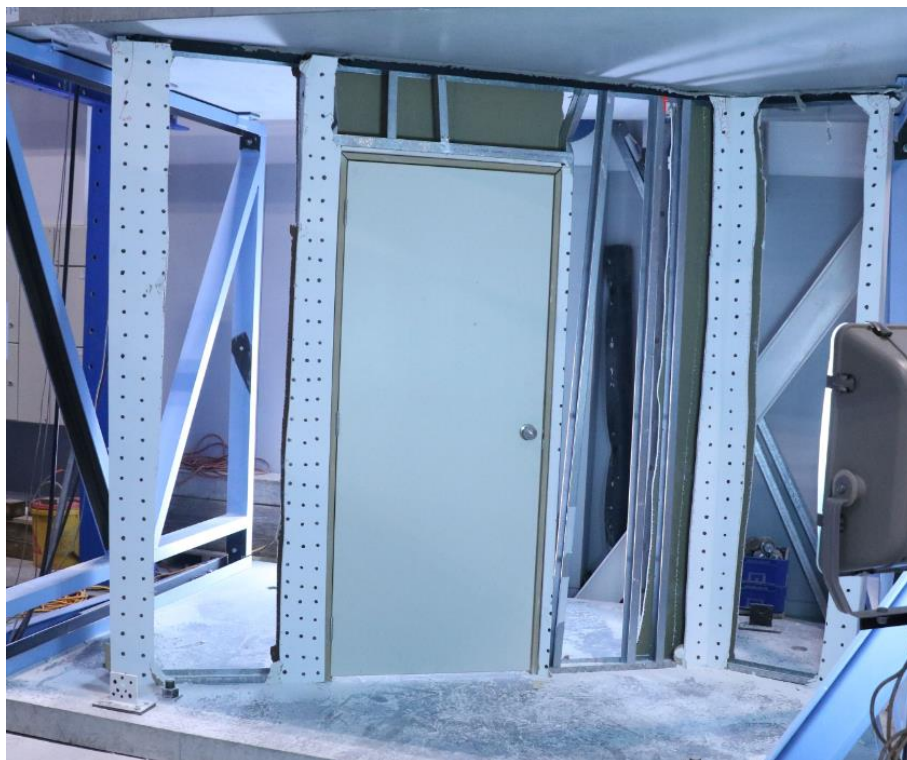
Specimen A3 – Post-test framing inspection —steel framing with linings removed
